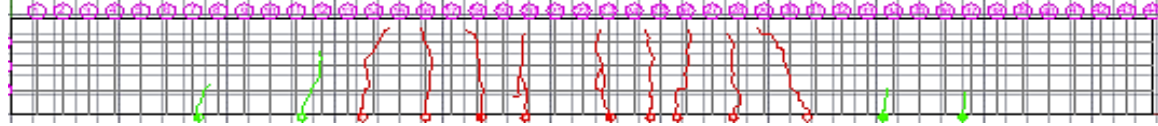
Mode of Failure (Specimen name is written on the beam)
